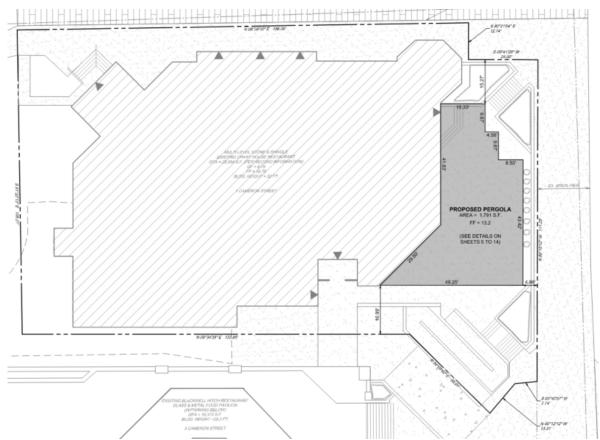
Site plan showing location of proposed pergola (Note that North is to page left)
